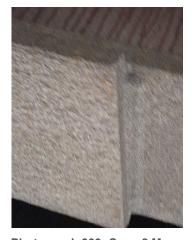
Span 8 Misaligned flange splice plate (bm 2) typ
